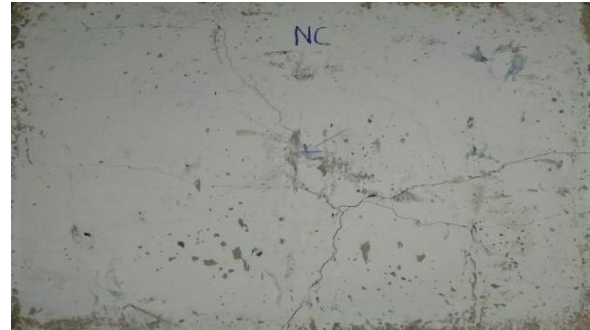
Crack Pattern of Conventional Concrete Slab
